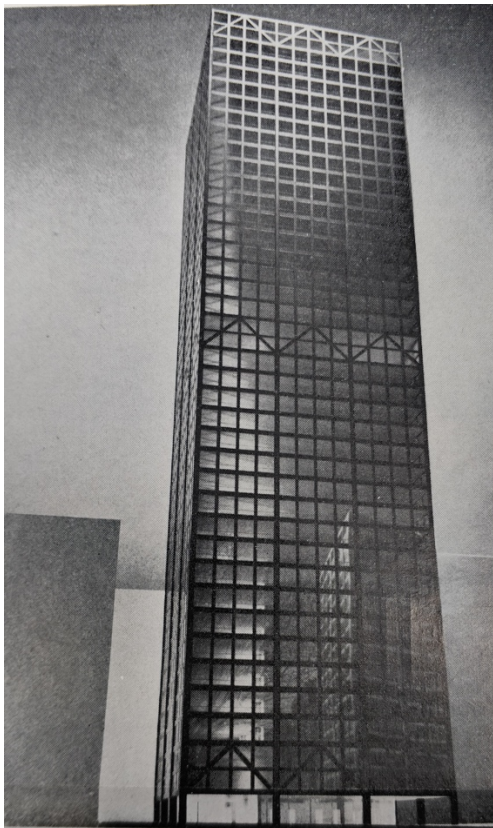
BHP Tower design drawing. Source: Cross Section, Issue 201 1969.
